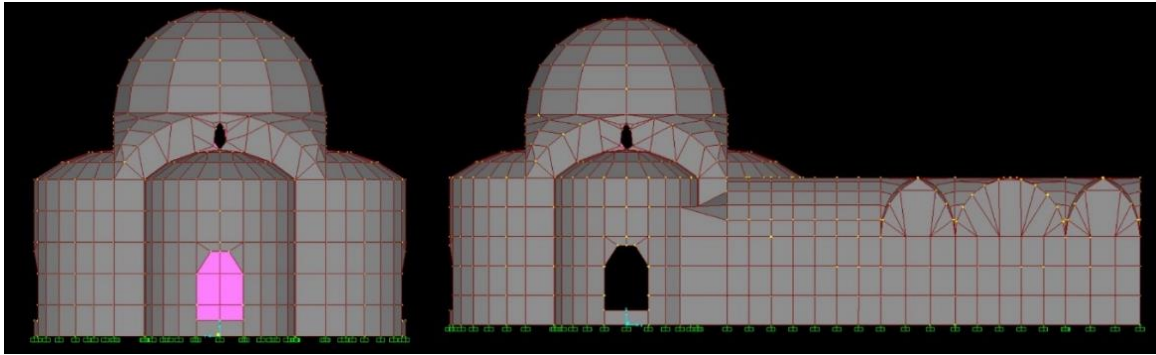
Surp Simon Church East Facade and North Facade Views (SAP 2000)
